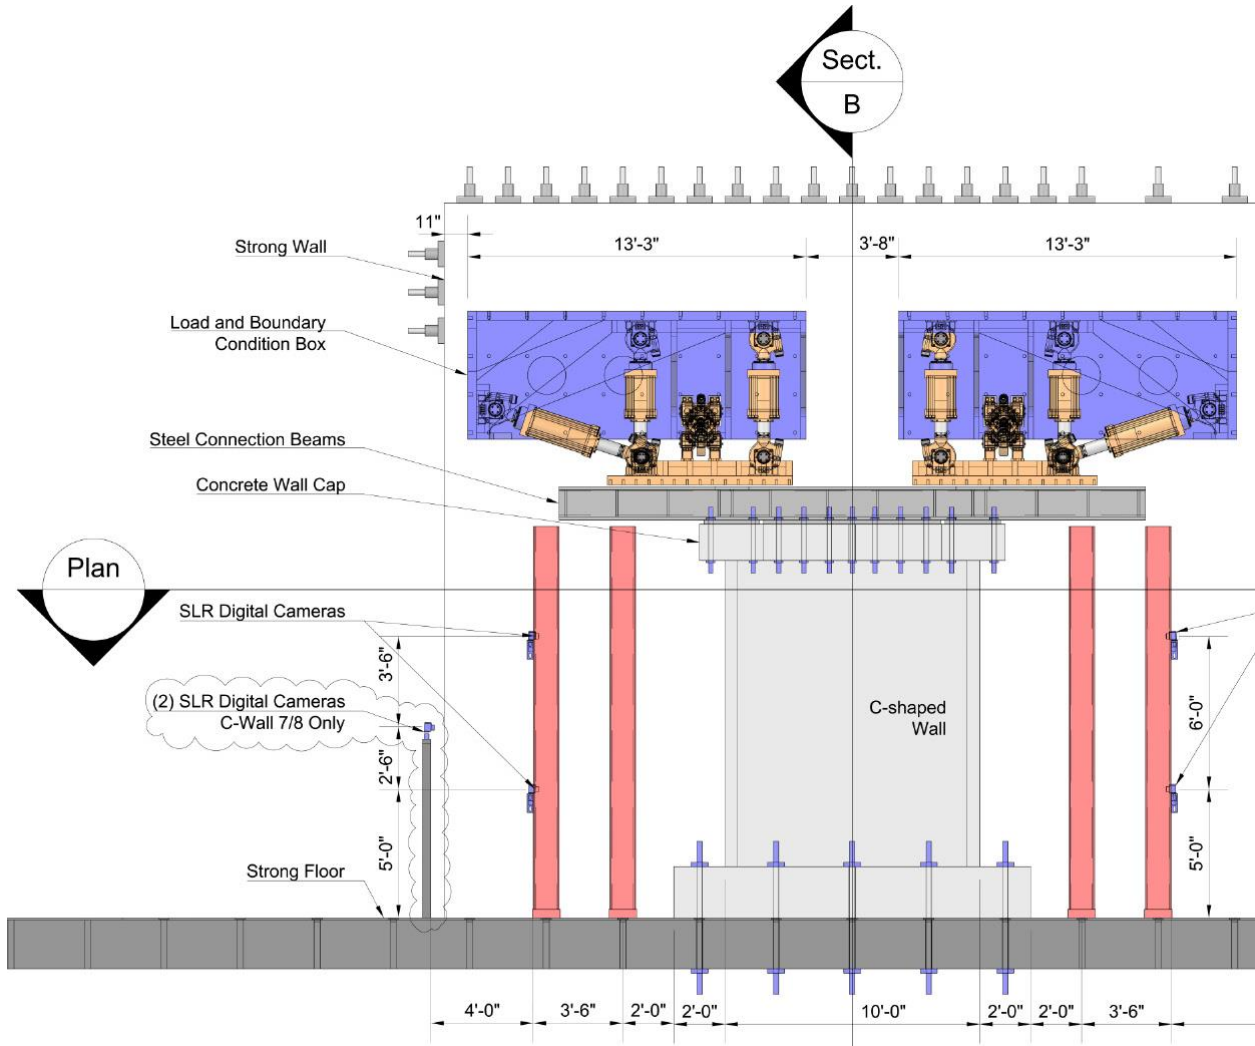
Front elevation drawing (Section A) of the experimental test setup
